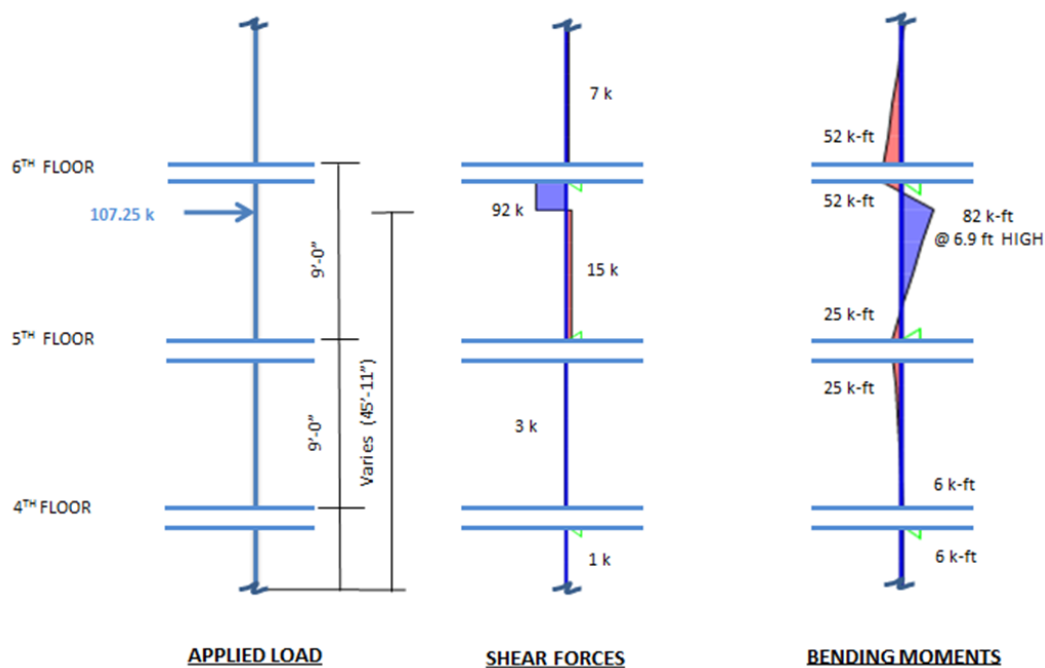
Impact load applied at "d" away from the end of column on the 5th floor
